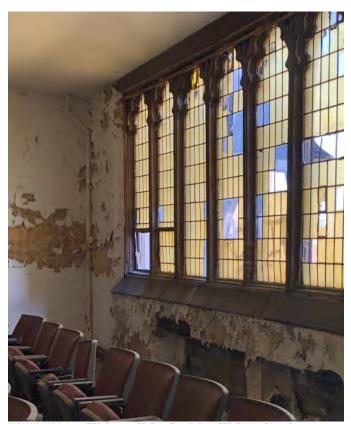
WATER DAMAGED PAINT AND PLASTER FINISHES AND FURNISHINGS. DAMAGED STAINED GLASS WINDOWS WITH MISSING GLASS AND FAILED JOINTS
